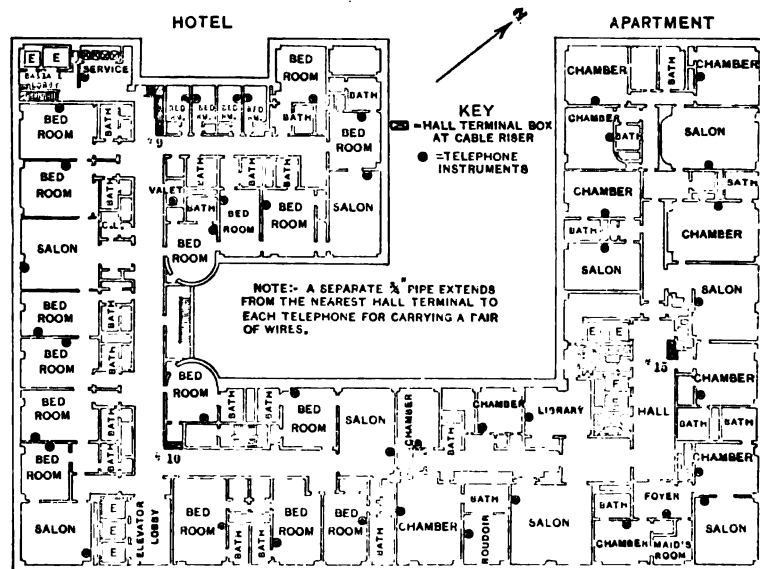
17-STORY COMBINATION HOTEL AND APARTMENT BUILDING, TYPICAL FLOOR PLAN.
